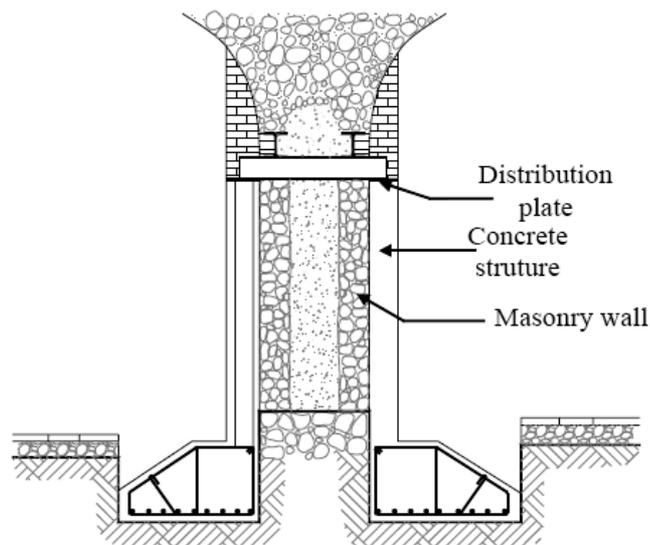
Concrete reinforcement of an existing foundation (EU-India cross program, 2006)
